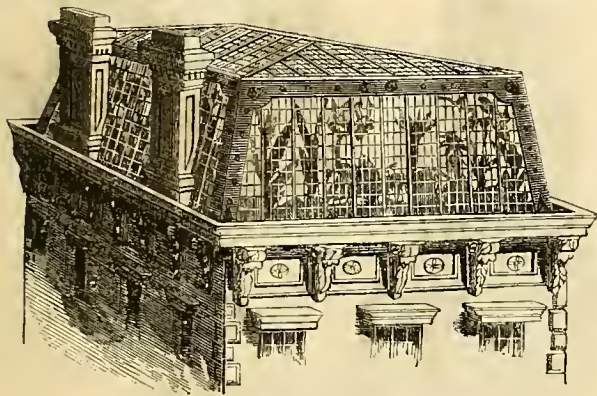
MANSARD ROOF CONVERTED INTO A GREENHOUSE.
